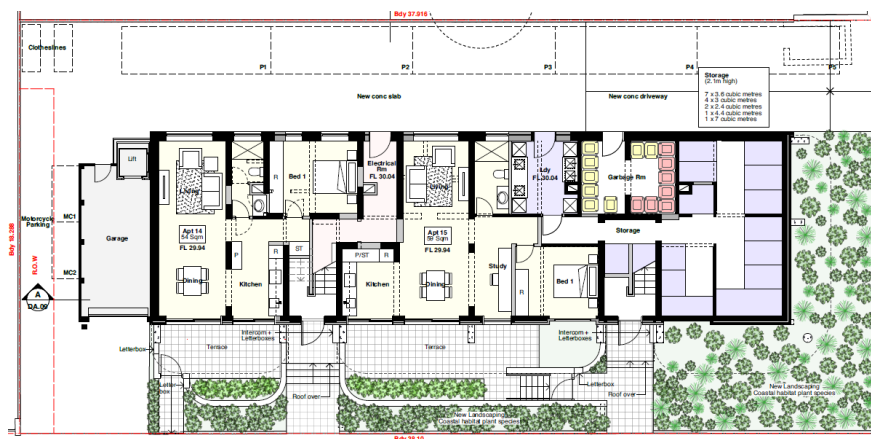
Revised ground floor plan in PL/39/2021 – 10 Major Street, Coogee (Source: Ken Powell Architect)
